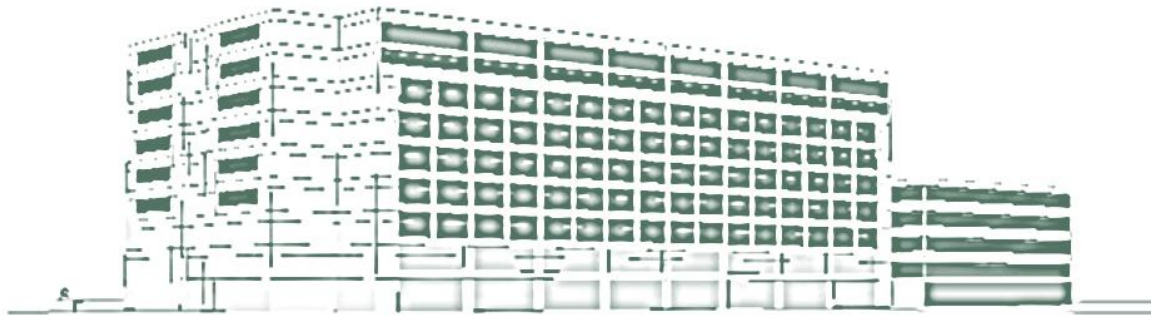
Exterior 3-d view of ASCENDAS building.
